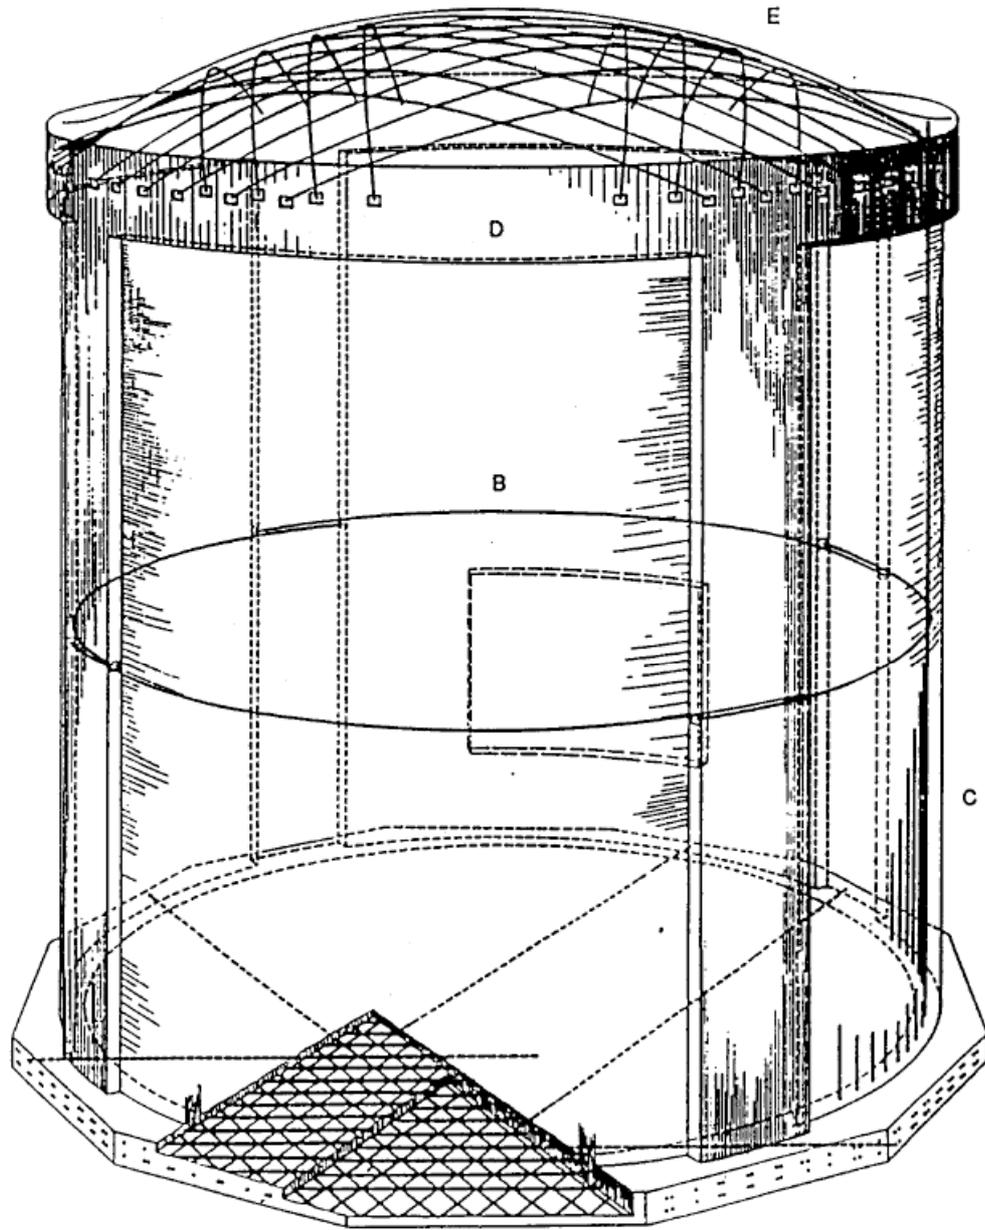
CANDU 6 Reactor Building Prestressed Containment Structure
